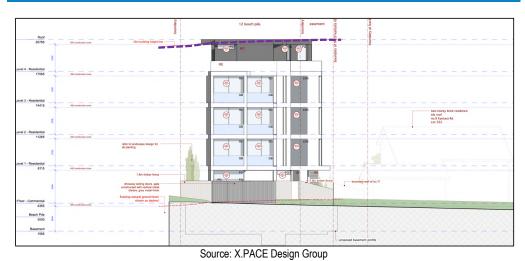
Proposed Height at Kantara Road Elevation (16m Height Line in Purple)
